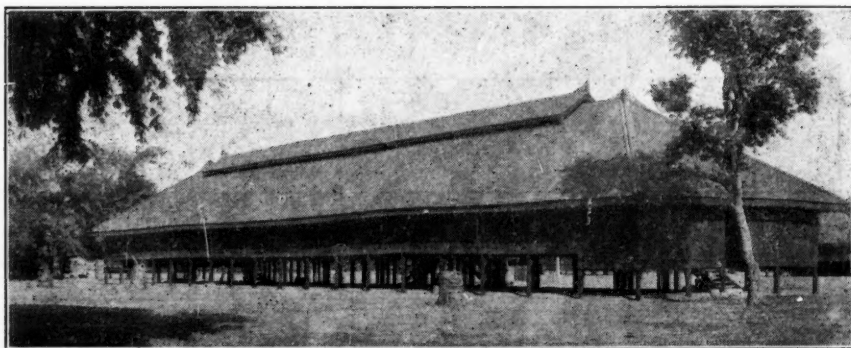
WAVE FORM OF SETTLEMENT, TIMBER BUILDING ON STILTS, 180 FT LONG
